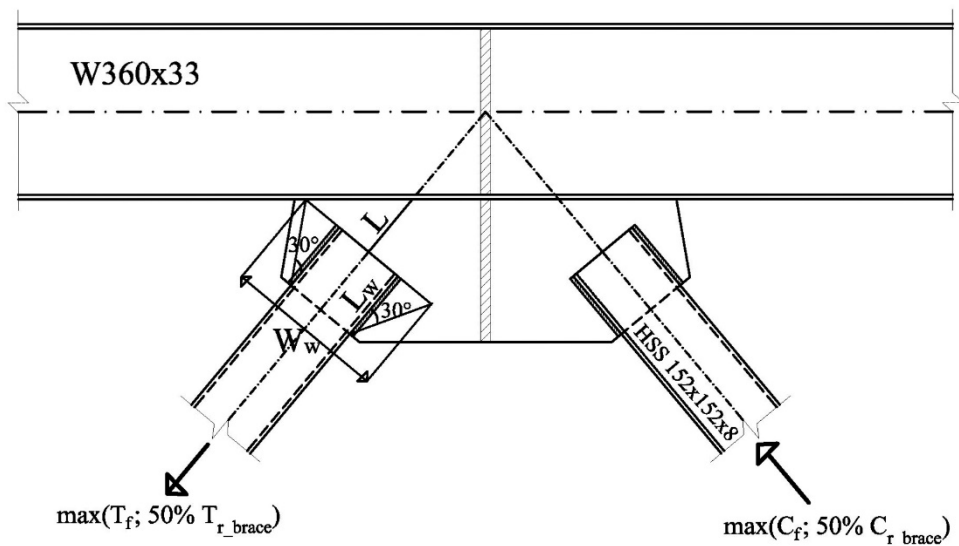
Middle connection detail at ground floor in E-W direction (pre-retrofit connection of 3-storey CBF, Quebec City)
